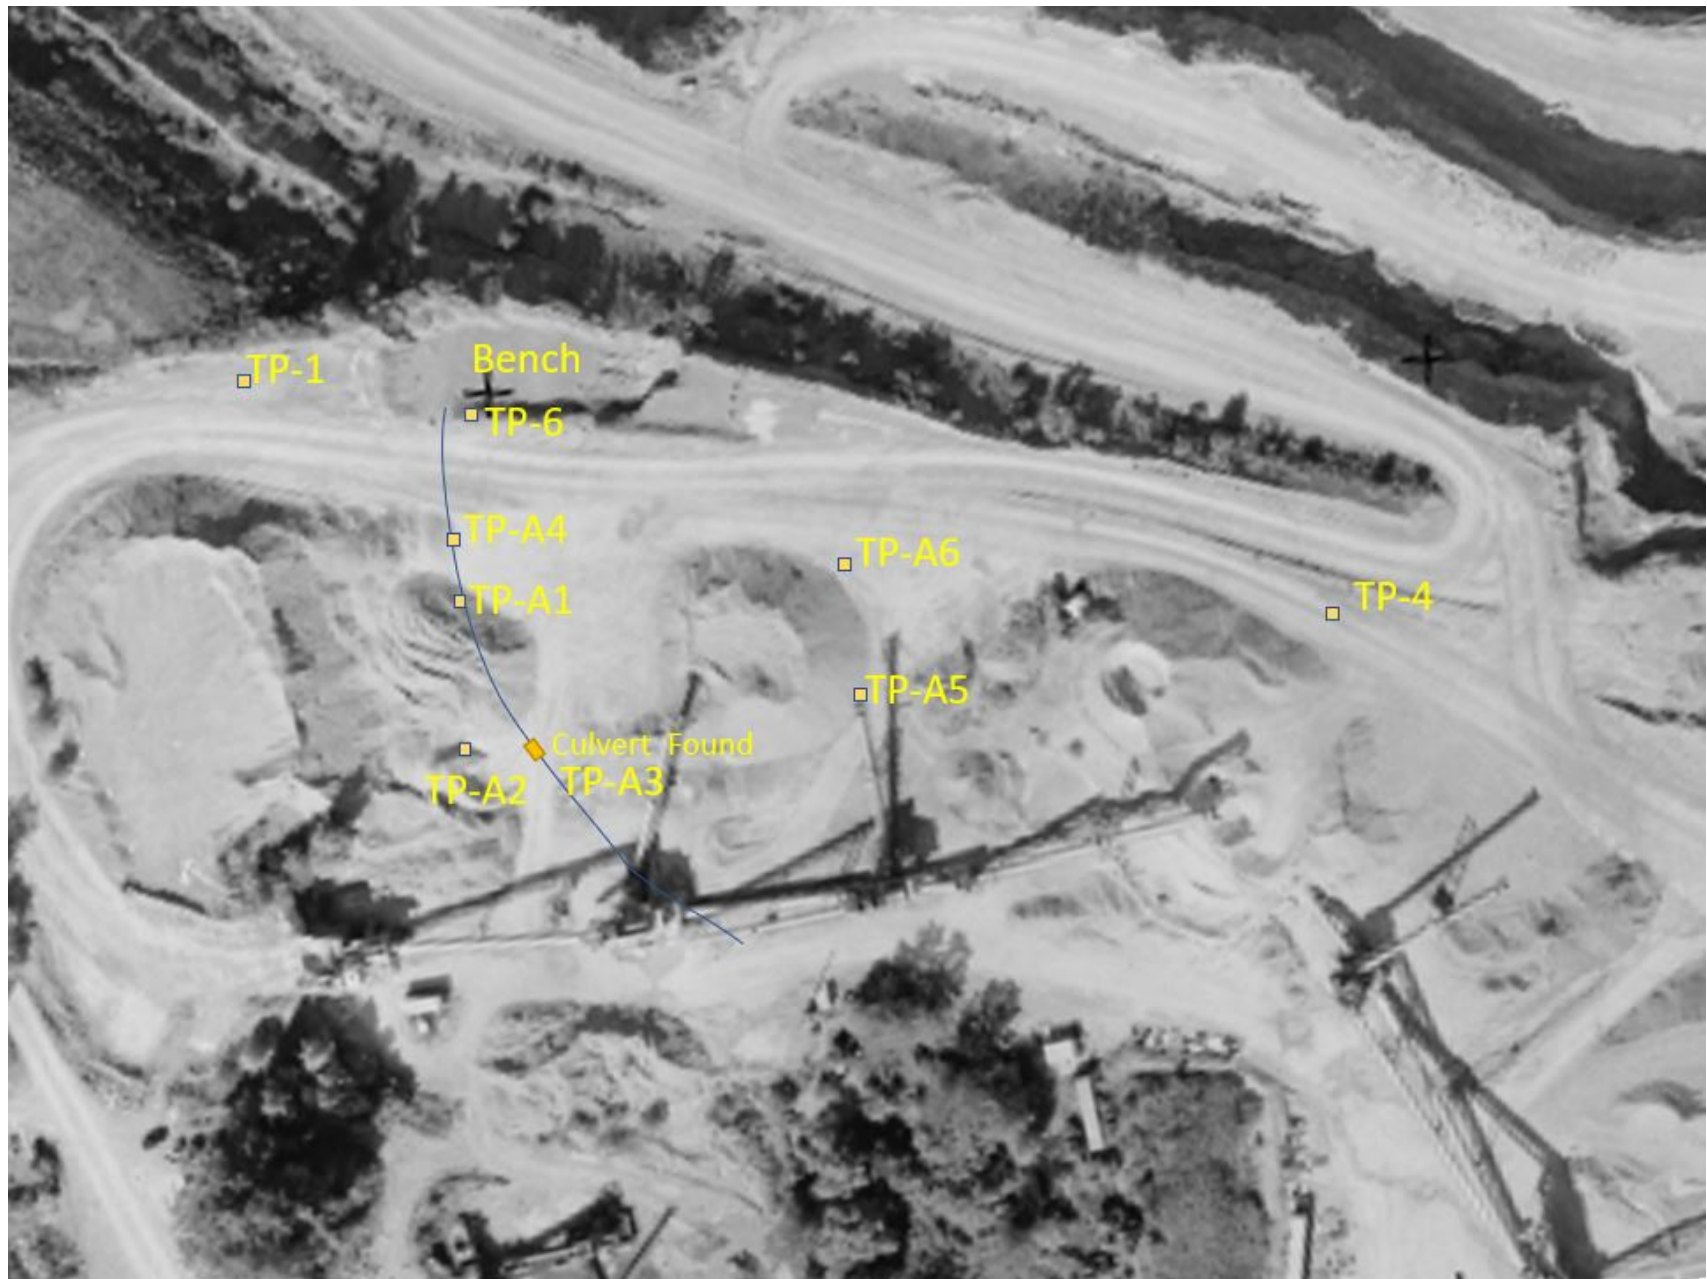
Test Pits and Culvert on 2014 Aerial Image (9-26-2014)
